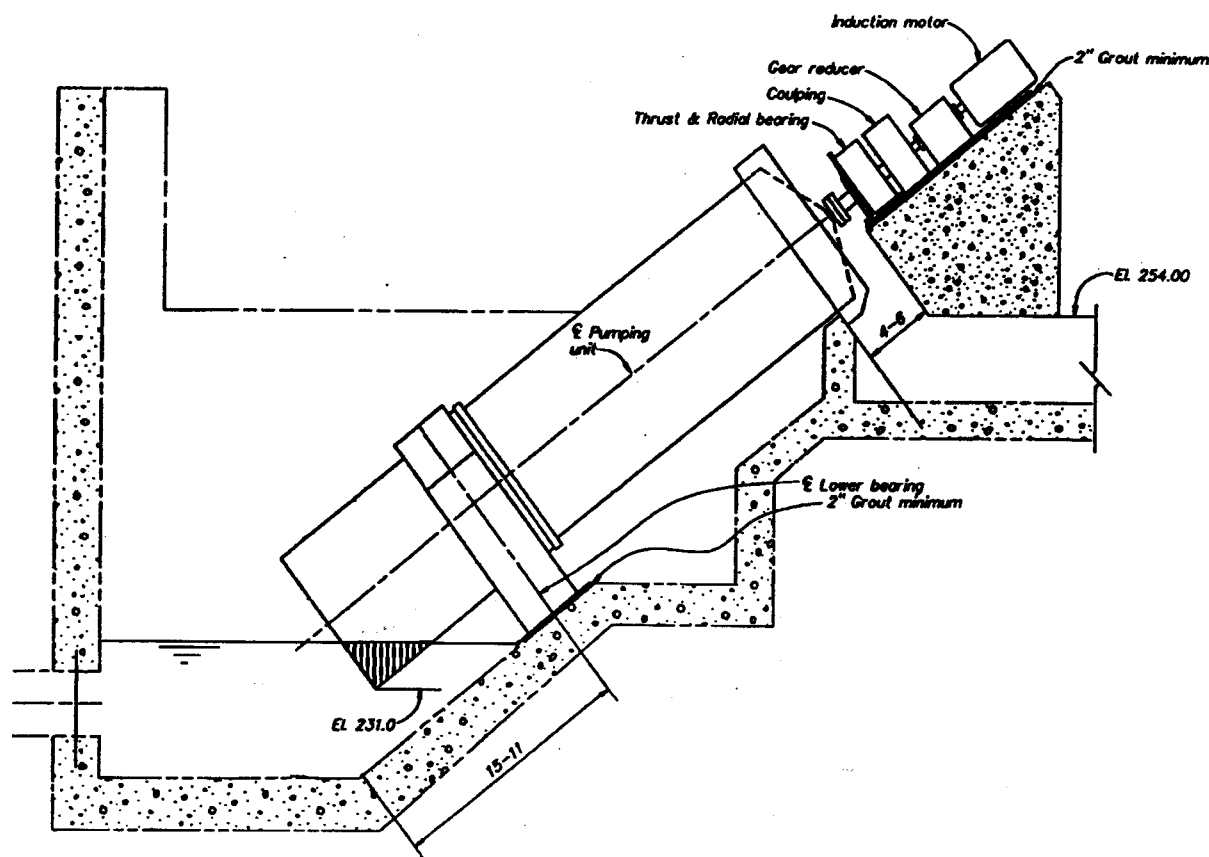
Typical Archimedes Installation. *Typical Archimedes pump installation with open intake from a nearly constant water surface elevation.
